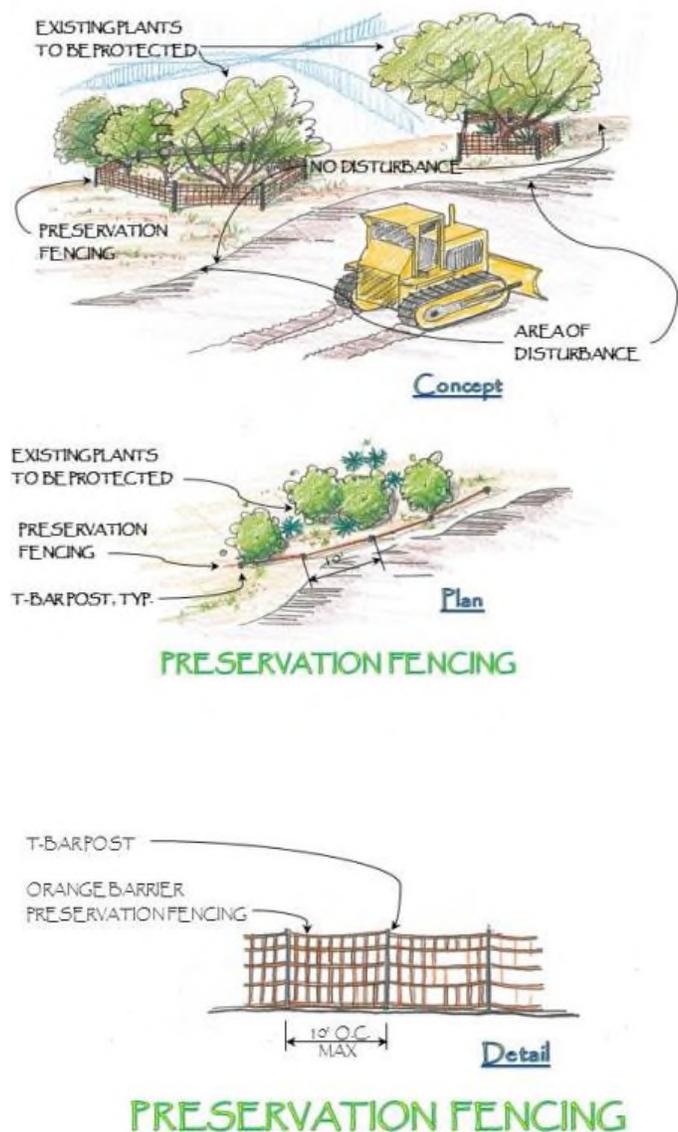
Detail of barrier fencing used to preserve existing vegetation.
